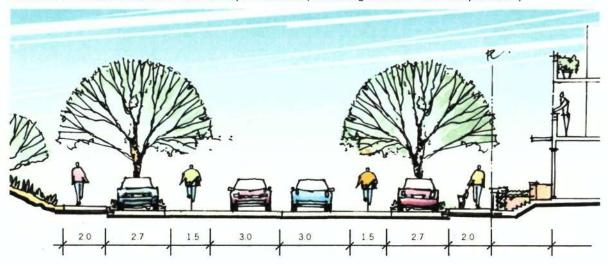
Illustrative Section across Tyee Road (Illustrating minimum streetscape widths)
